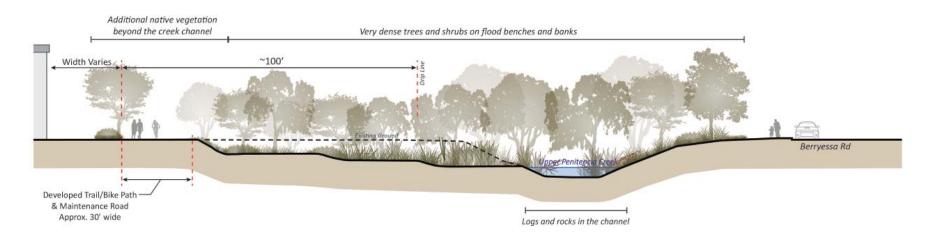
Existing and proposed cross sections for Upper Penitencia Creek. Not to scale. Created by author.
